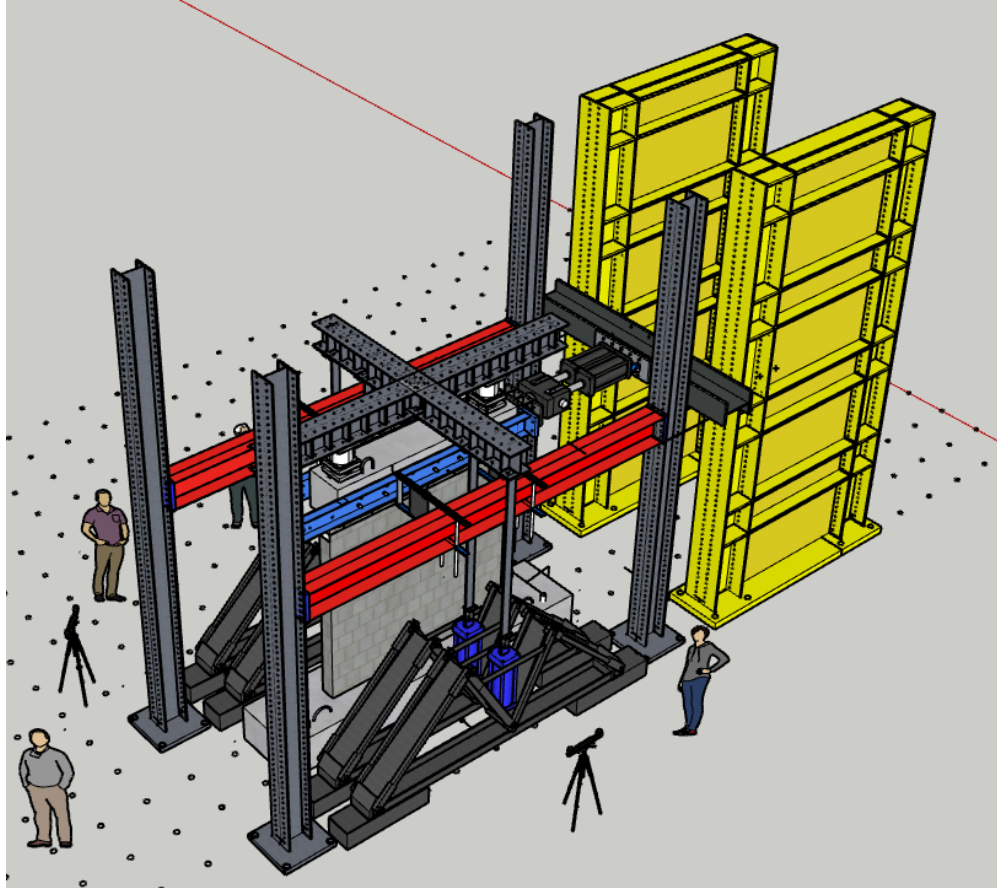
3D-Model of testing set-up for the full-scale specimens
